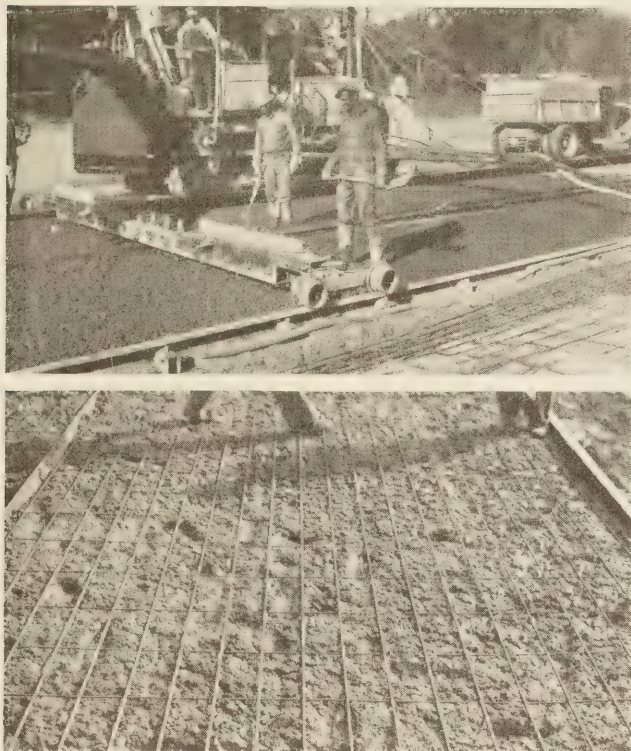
CONSTRUCTION OF SLABS HAVING WELDED FABRIC REINFORCEMENT. UPPER, STRIKING OFF CONCRETE PREPARATORY TO PLACING WELDED FABRIC; LOWER, WELDED FABRIC IN PLACE.
